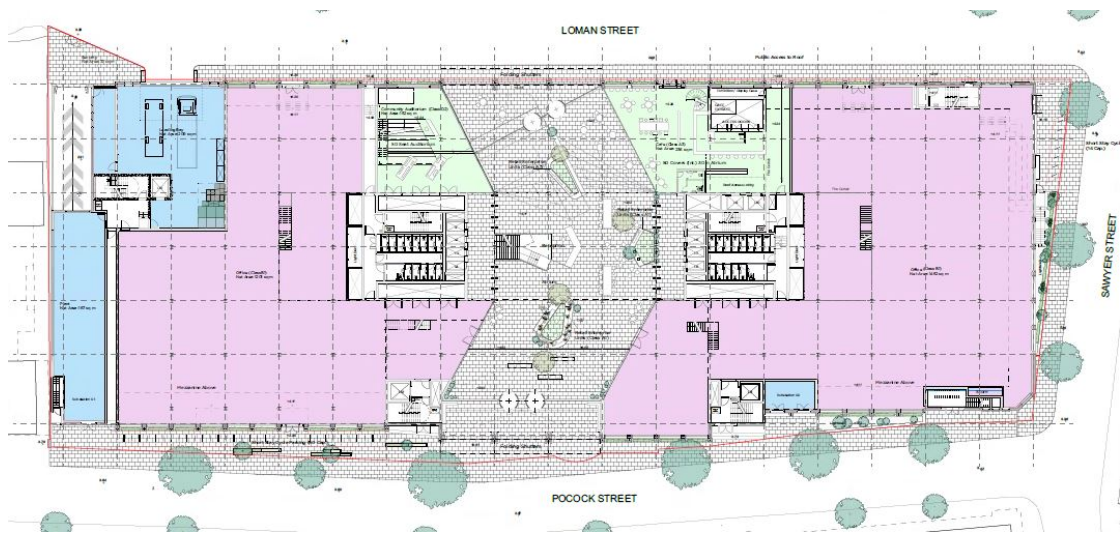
(above): Ground floor plan of the proposed building, showing the publicly-accessible central route, framed by the café, auditorium and office space.
